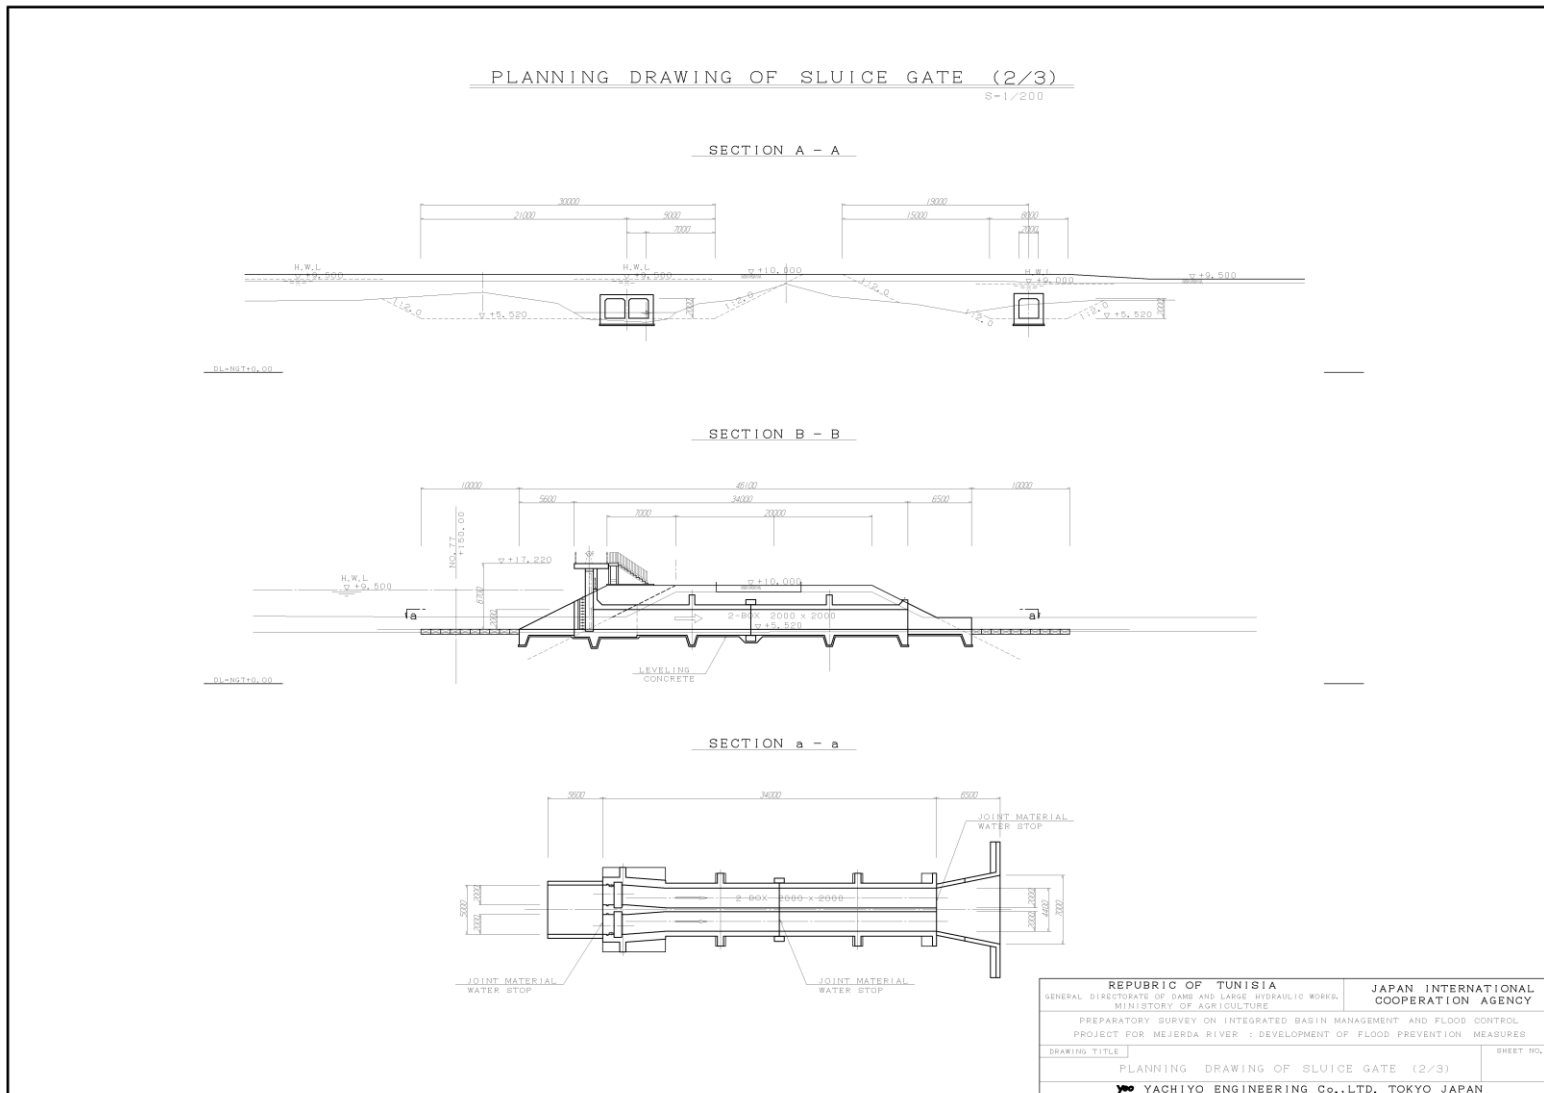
Typical Drawing of Flow Control Facilities (2) Diversion Channel Gate
